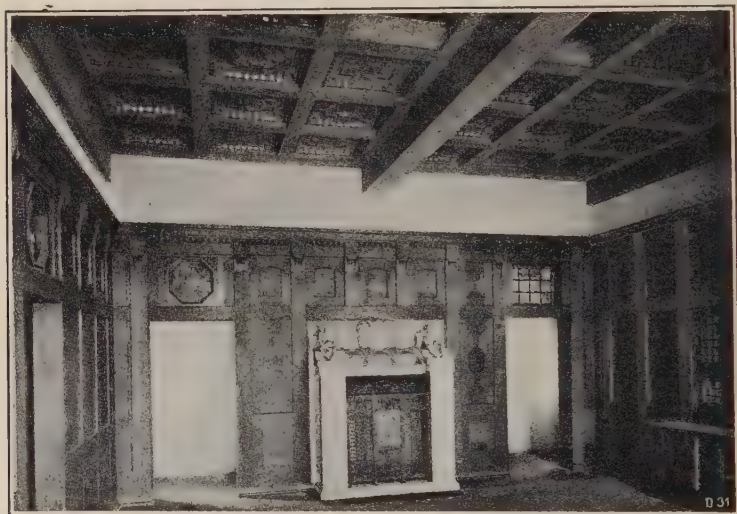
REINFORCED CONCRETE HOUSE, DRESDEN, GERMANY.
